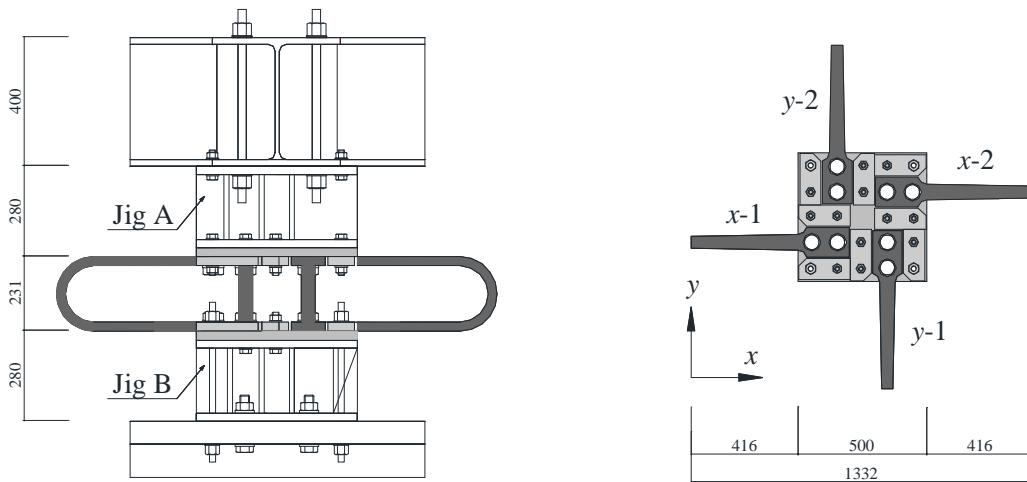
Details of the connection between the specimen and the loading jigs (A and B).
